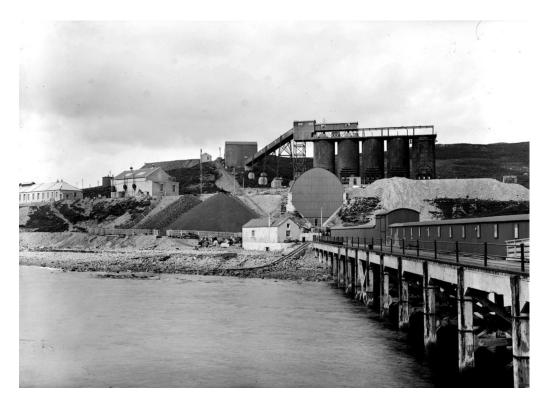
Pier and processing plant at East Suisnish, including five cylindrical calcining kilns, store (to left of pier), coal dump and storage hopper (with arch roof). At the top of the short rail incline is the Pier Hauler Incline House, to the right of which is the crusher with a conveyor to the top of the kilns. Coal was taken to the crusher via the short rail incline, where it was mixed with the unprocessed ore and thence to the kilns. [BGS P000043]
